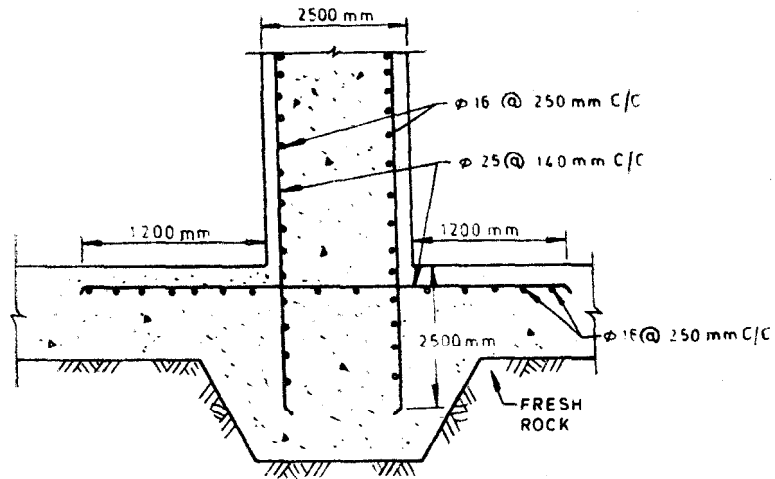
TYPICAL REINFORCEMENT DETAILS OF ANCHORAGE
